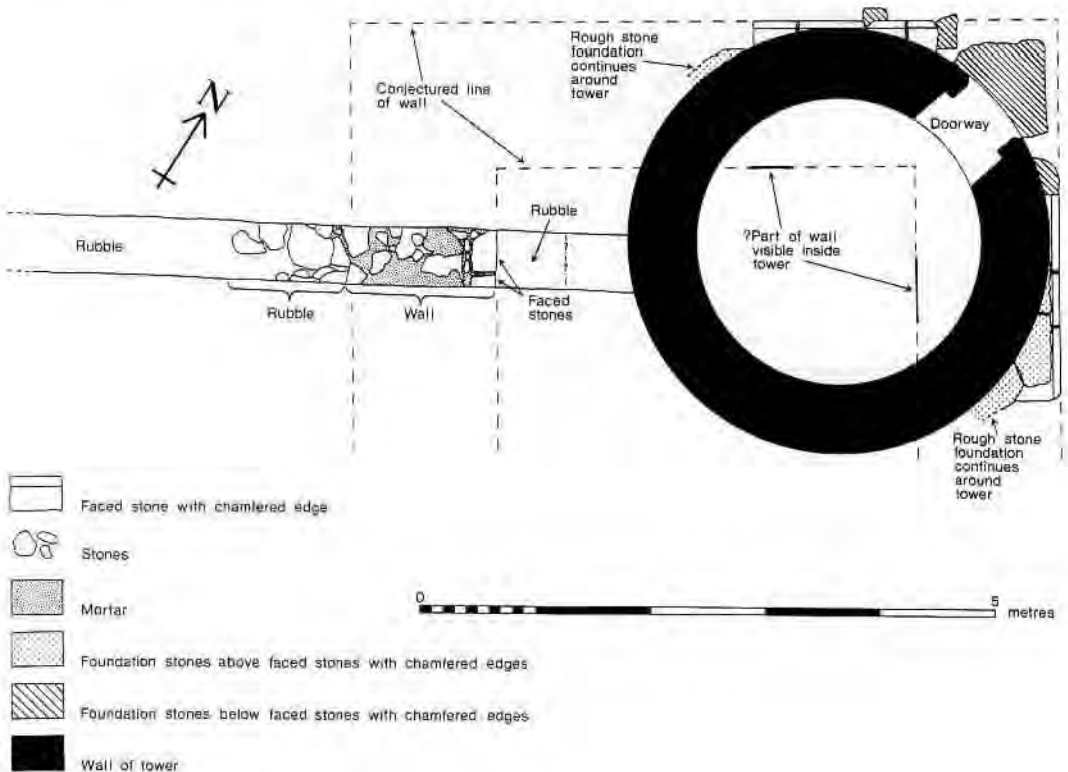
Plan of part of excavation trench and tower on St. Michael's Hill, Montacute, showing the position of earlier wall foundations.
